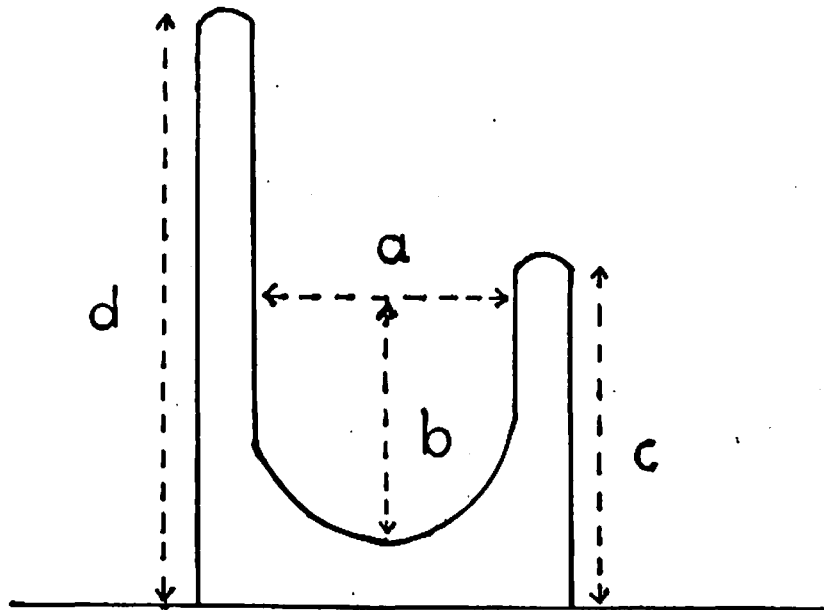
Dimensions of manger : a) width; b) depth; c) height of inner wall; d) height of outer wall.
